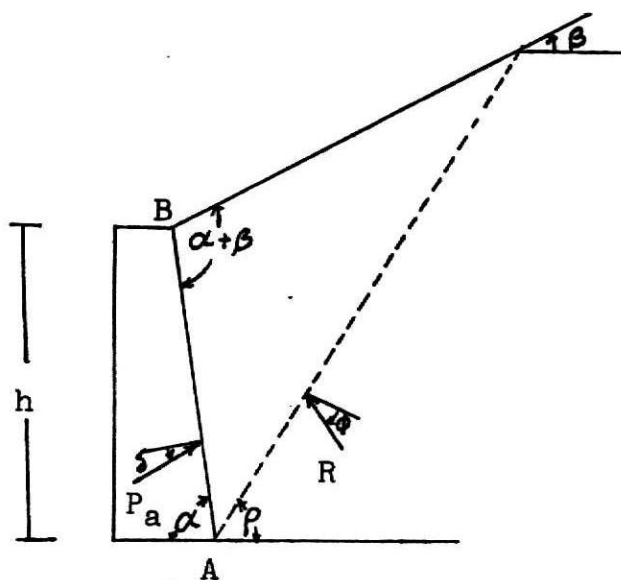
Retaining wall with inclined wall and sloping surcharge
